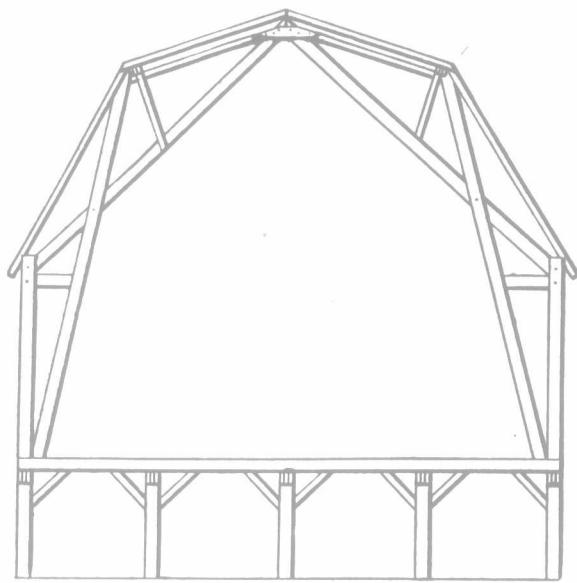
Barn Bent, Showing Gambrel Roof Construction.
